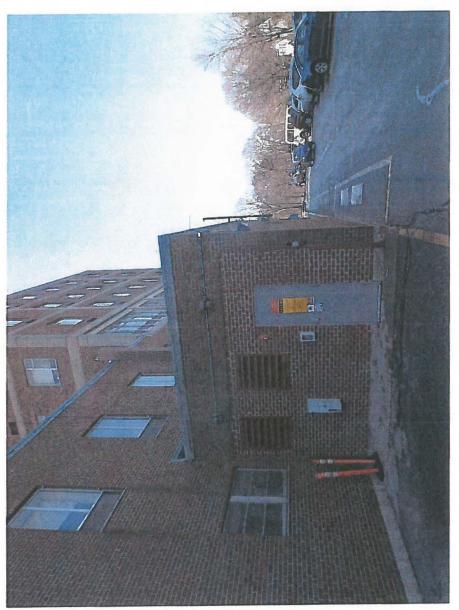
View of Verizon Wireless equipment room and fiberglass chimney
